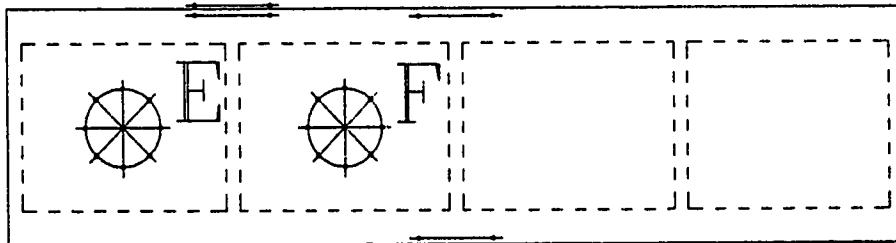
Pilot test beam Demec gauge placement on Panels E and F
